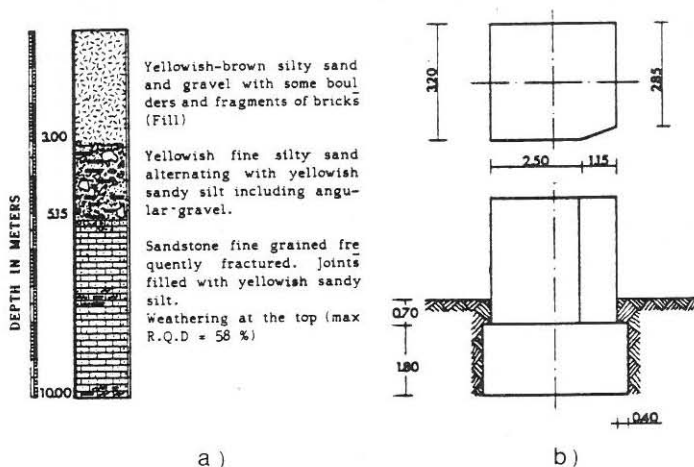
a) Profile of the subsoil - b) Elevation and plan of typical pier (dimensions in meters)
